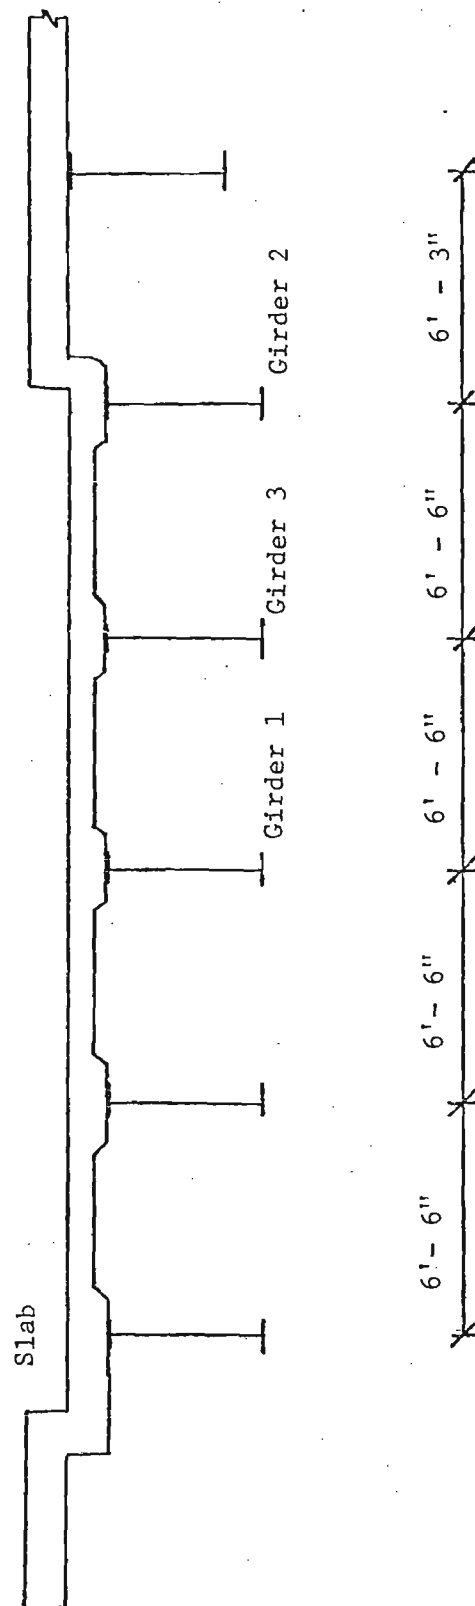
Cross Section of Camp Creek Parkway - 117' span.
